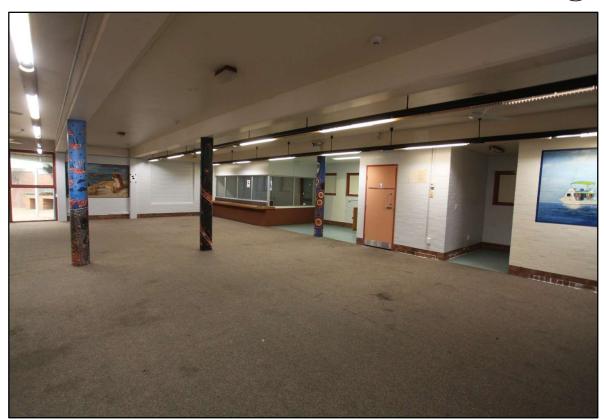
Block A visitor area showing Lenoard Lawson murals and access to outsdie undercover courtyard
